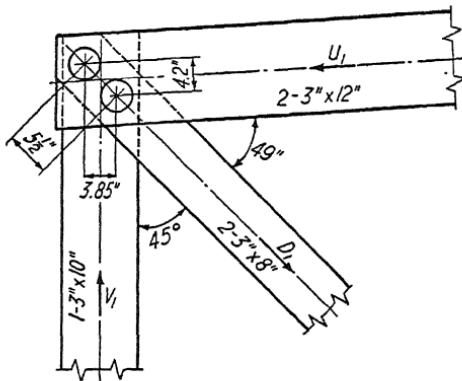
Top corner joint for 60-ft. Pratt truss.
